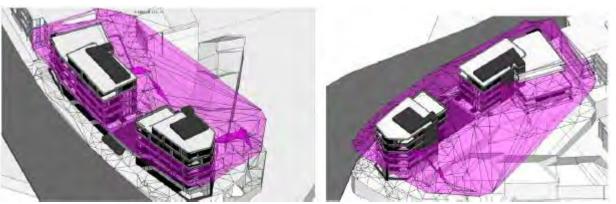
View from north (left) and south (right) with 12.5m building height plane in purple
